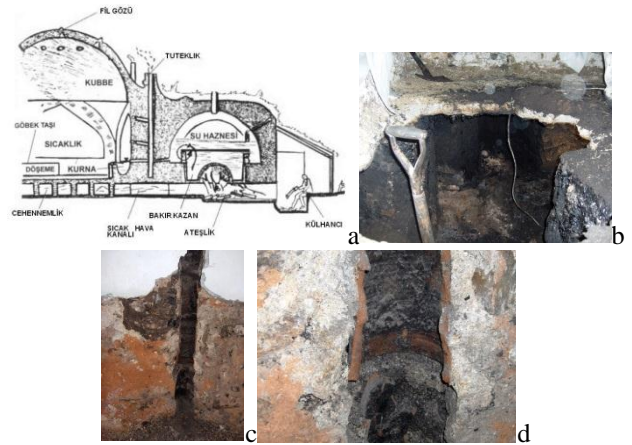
a-Heating system detail from a typical Turkish bath [18], b-hypocaust section in Bolu, Mudurnu, Yıldırım Bayezid Bath in Turkey with c-d-tüteklik pipe detail [27]
